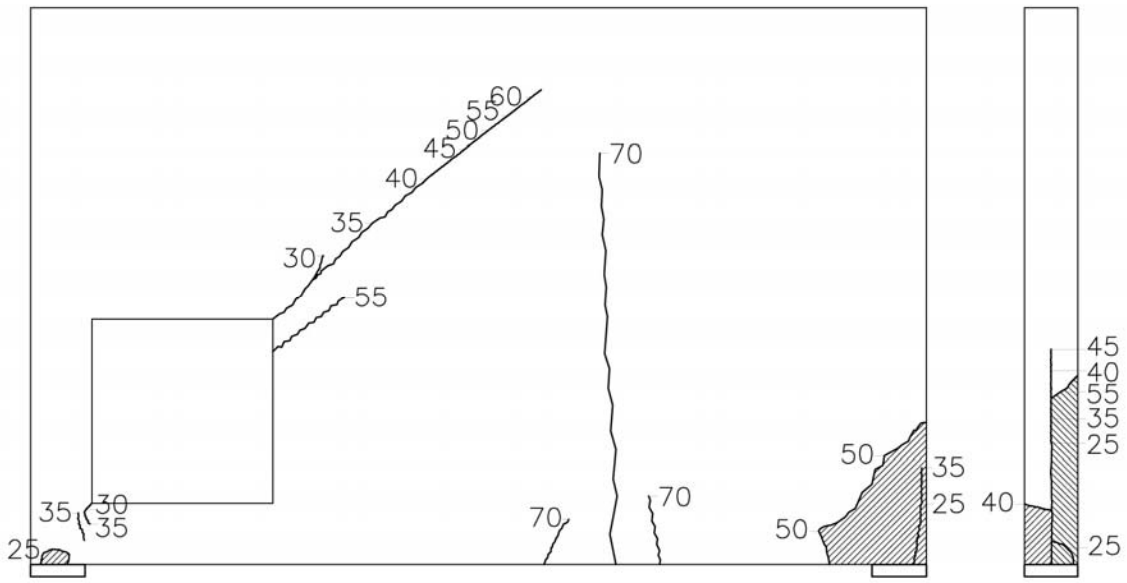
RC specimen cracks – front face. Numbers indicate loading steps in kips (shaded areas indicate spalling)
